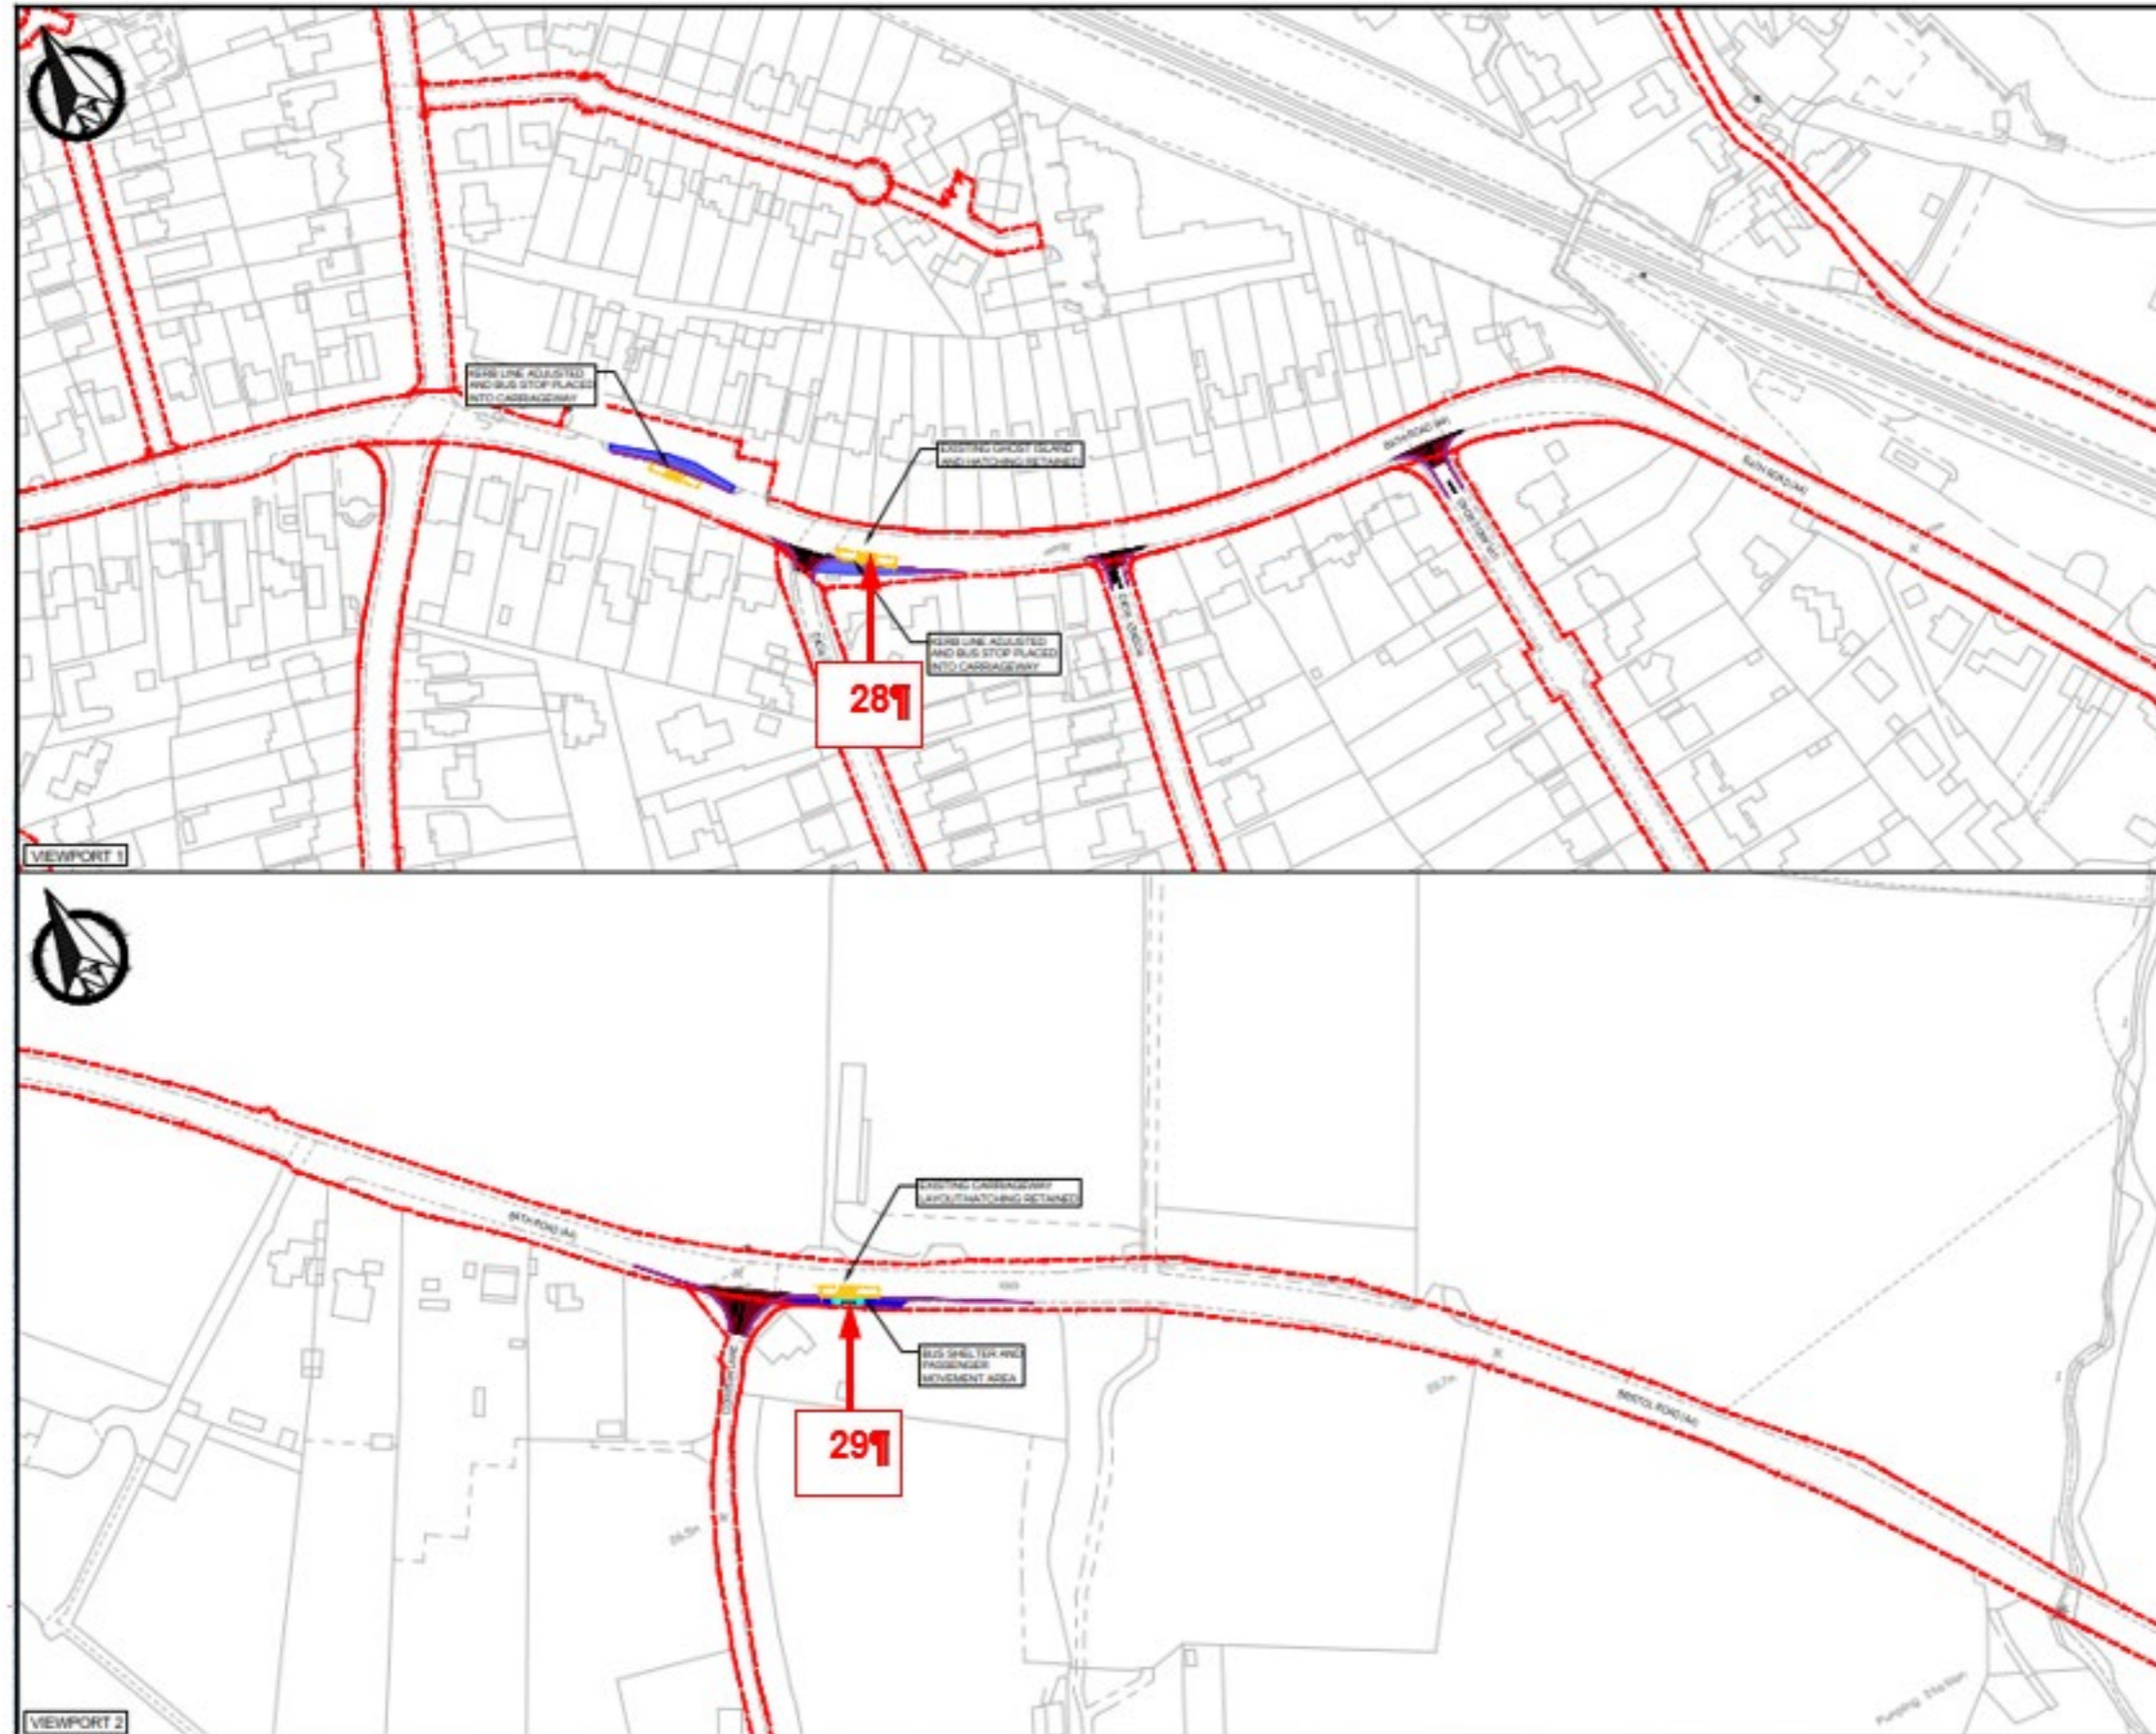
Section 5 Road Safety Audit Problem Location Plan
